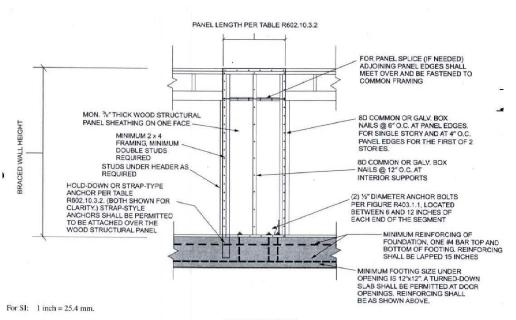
ALTERNATE BRACED WALL PANEL
